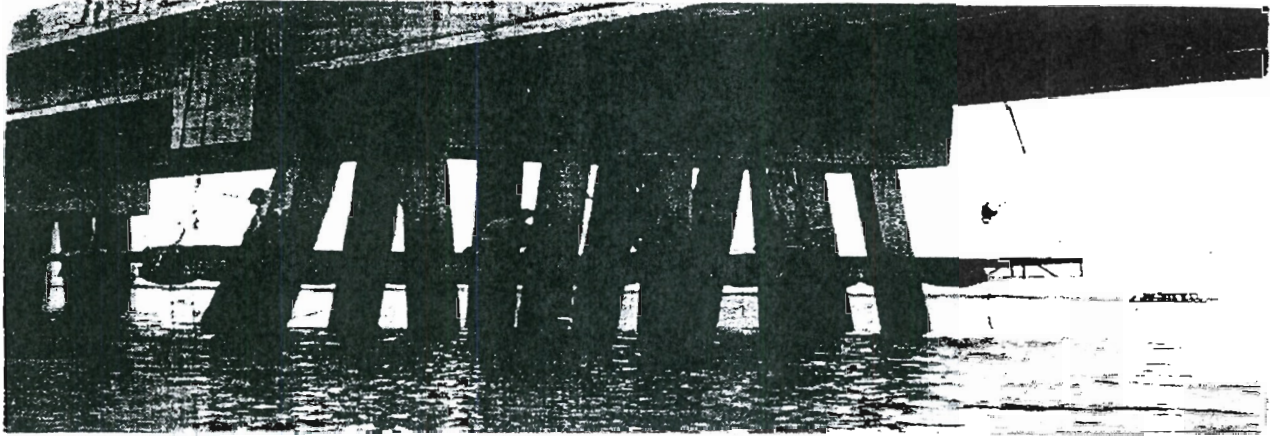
The reinforced concrete bridge in Campeche State, Mexico
